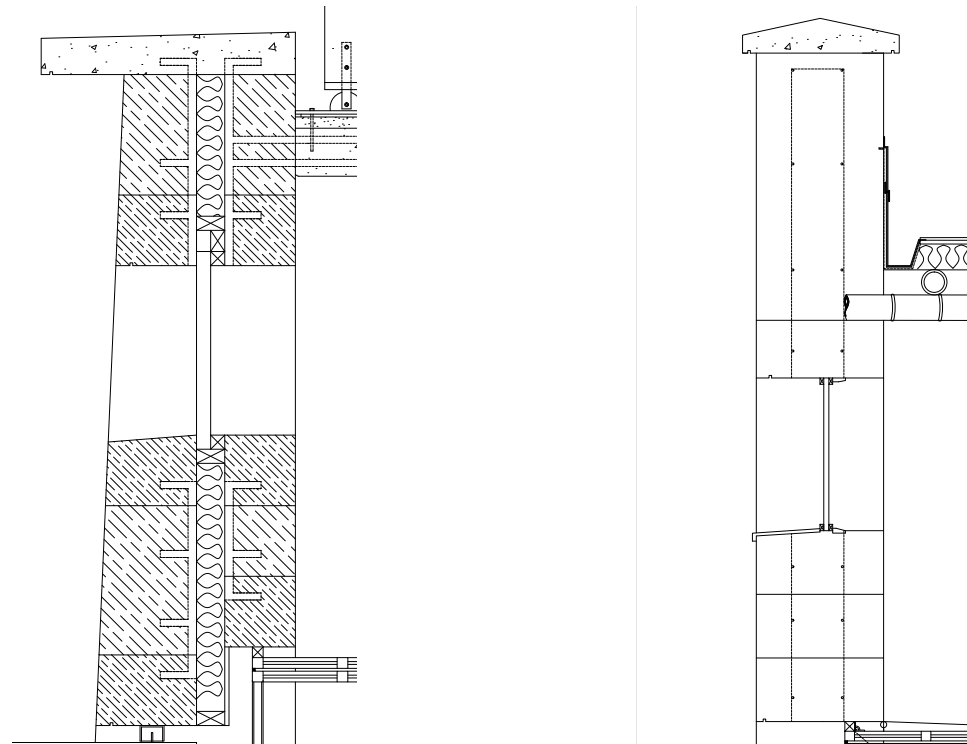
Rammed Earth investigation, Details, Author (2015)
